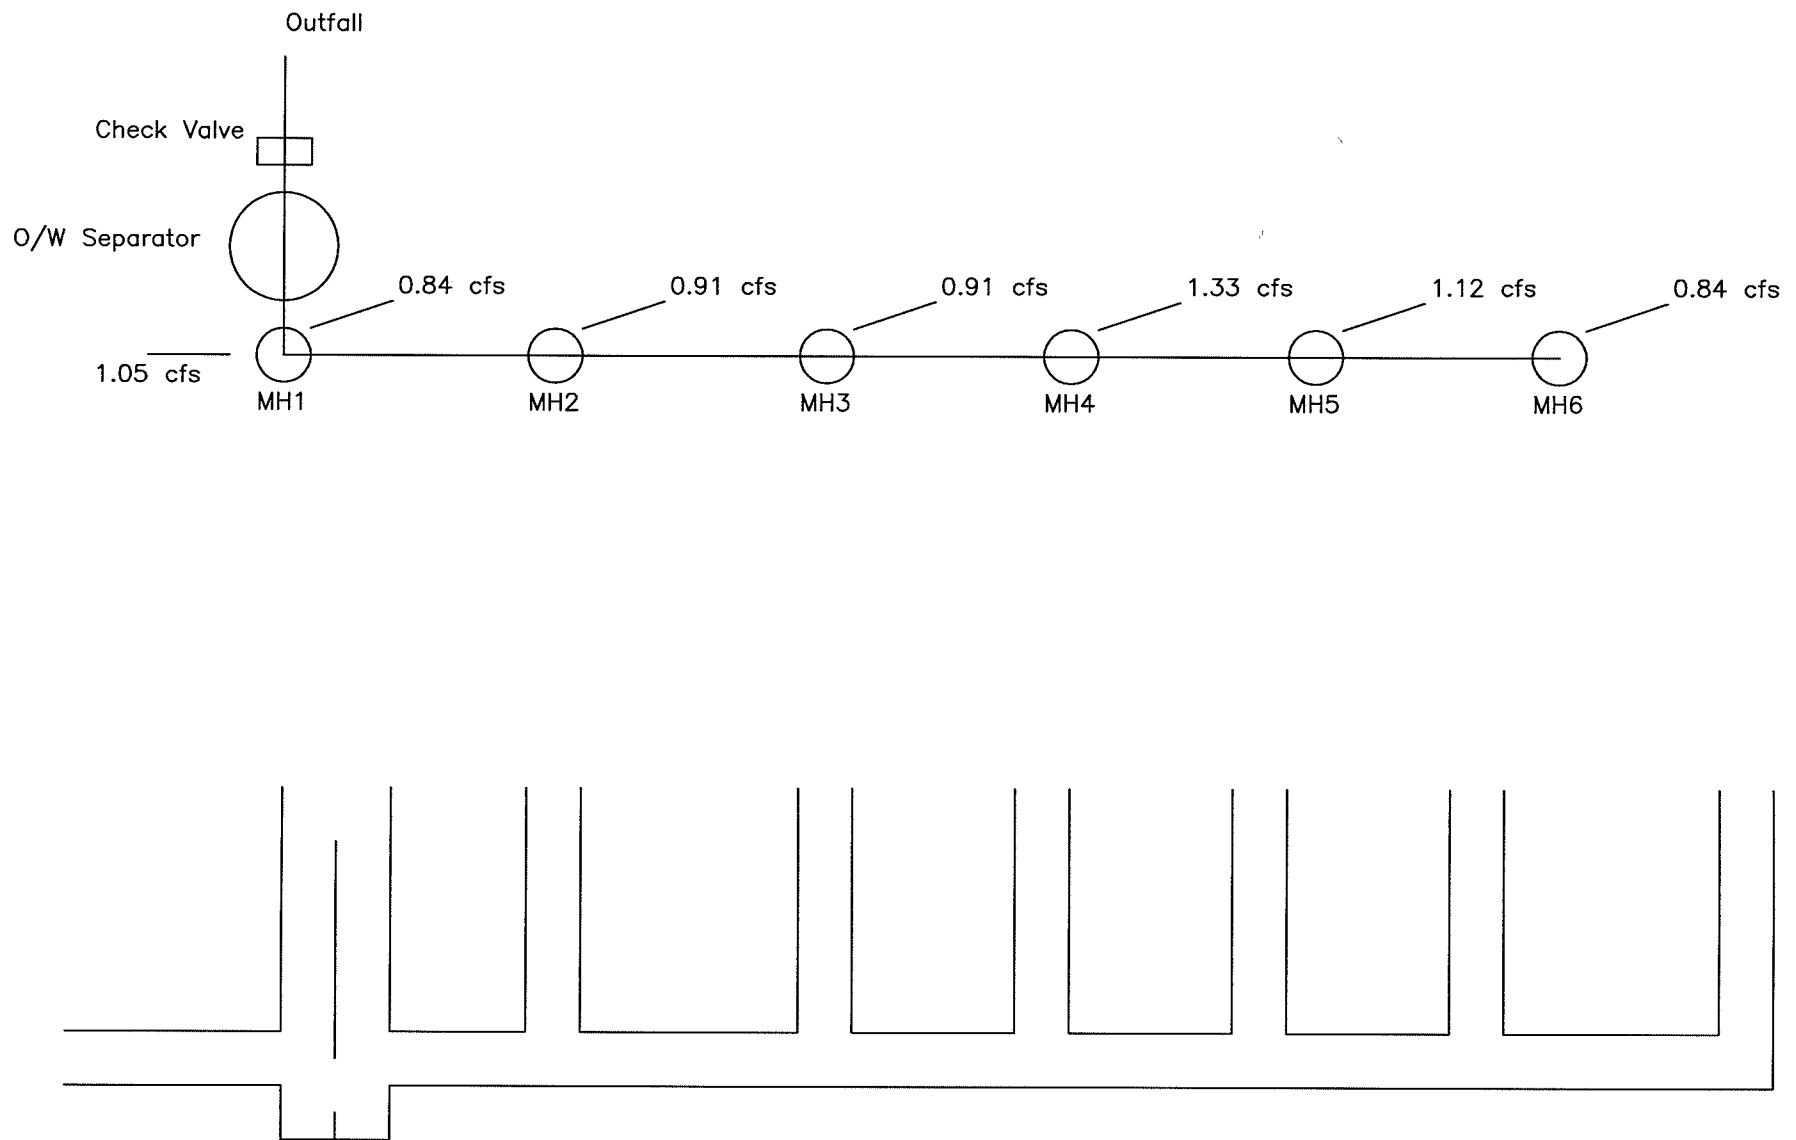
Schematic Plan and Profile of the Six-Manhole Configuration.
